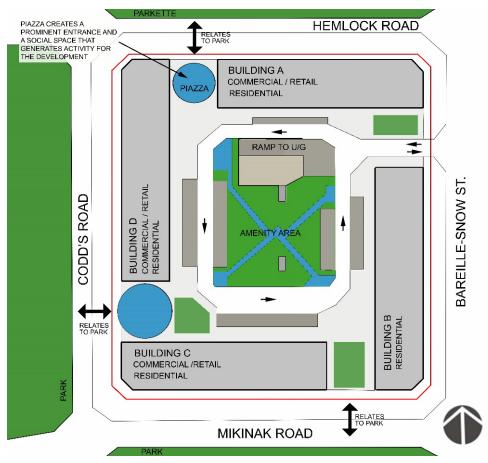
Preliminary site plan showing connectivity with surrounding parks and adjacent thoroughfares.
